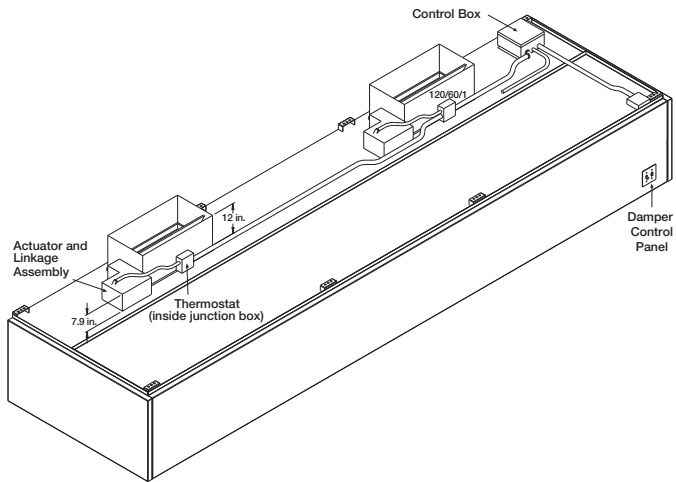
Hood Mounted Control Box with Hood Mounted Damper Control Panel
